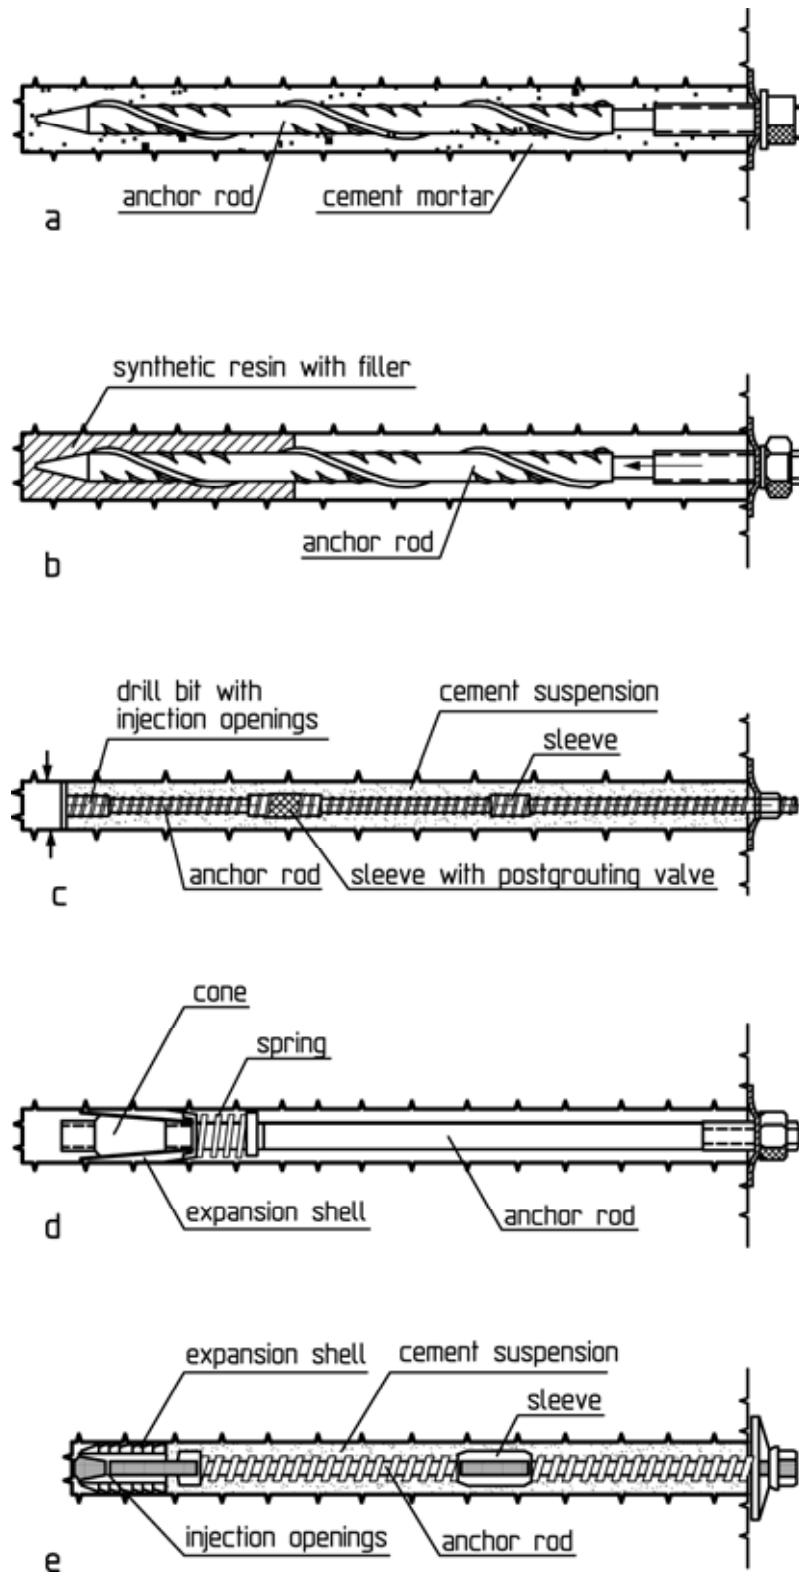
Anchors: Cement mortar anchor (SN-anchor); b) synthetic resin anchor; c) injection drill bolt (IBO-bolt); d) expansion shell bolt; e) injection bolt with expansion shell
